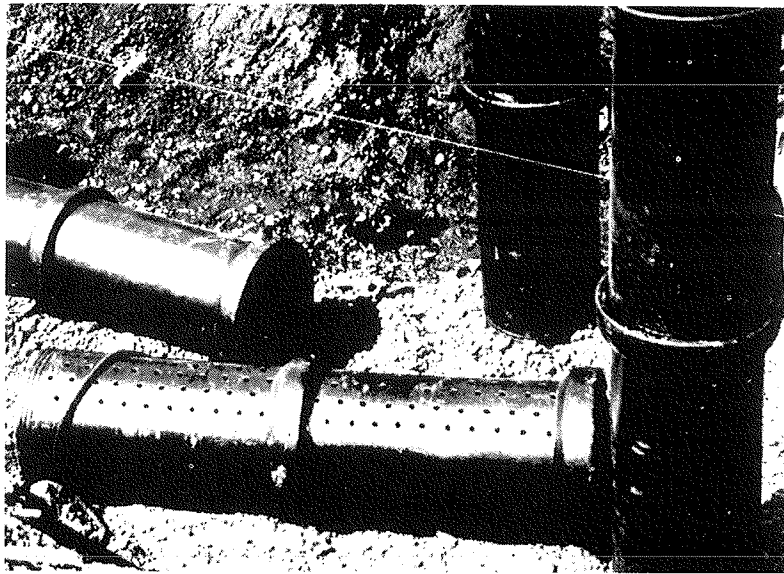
In this installation of a subdrain perforated pipe is used and installed with holes down. Note the string line to assure installation to proper grade and alignment. (Courtesy Clay Products Association)
